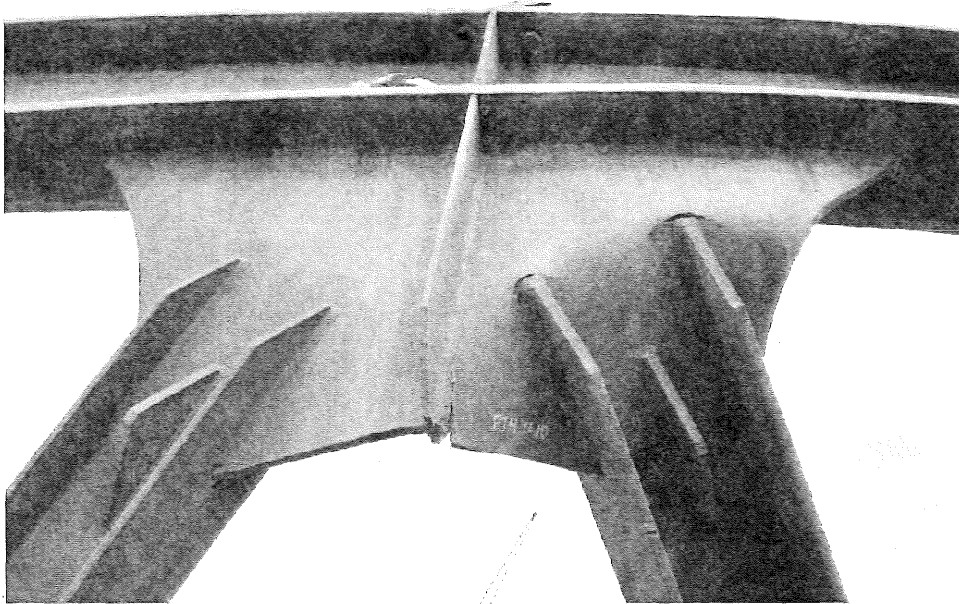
Typical cracking at floor truss weld terminations due to collapse.
